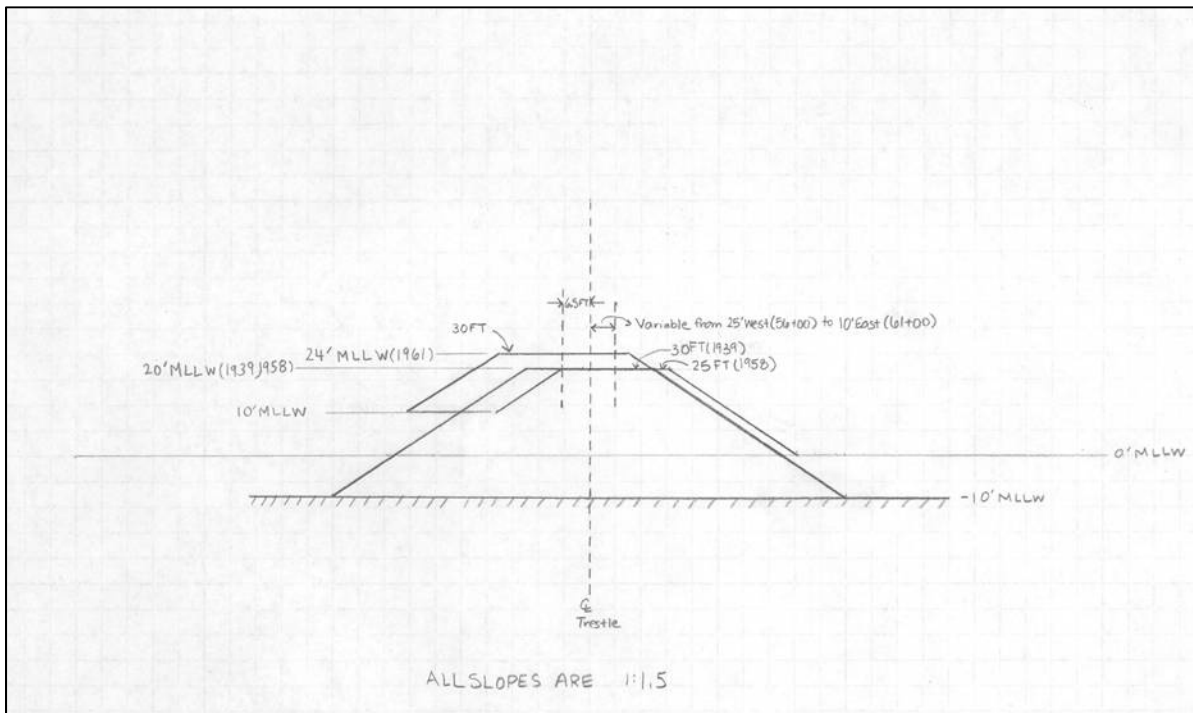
148. Jetty A Cross Section Templates - 56 to 61 – Trunk
